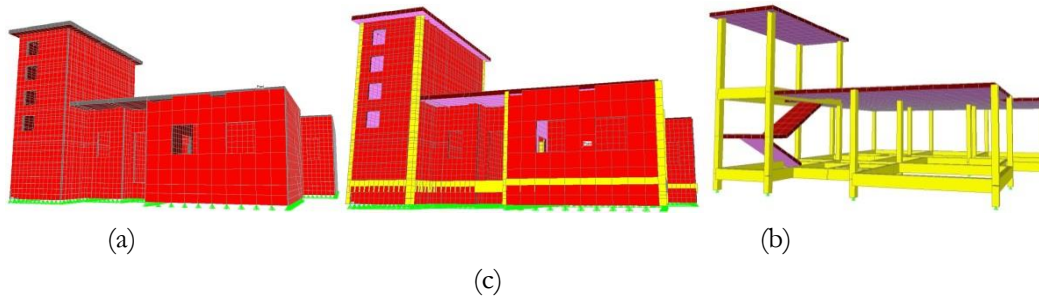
(a) Concrete rigid frame model, (b) Masonry wall bearing model, (c) Mixed model
